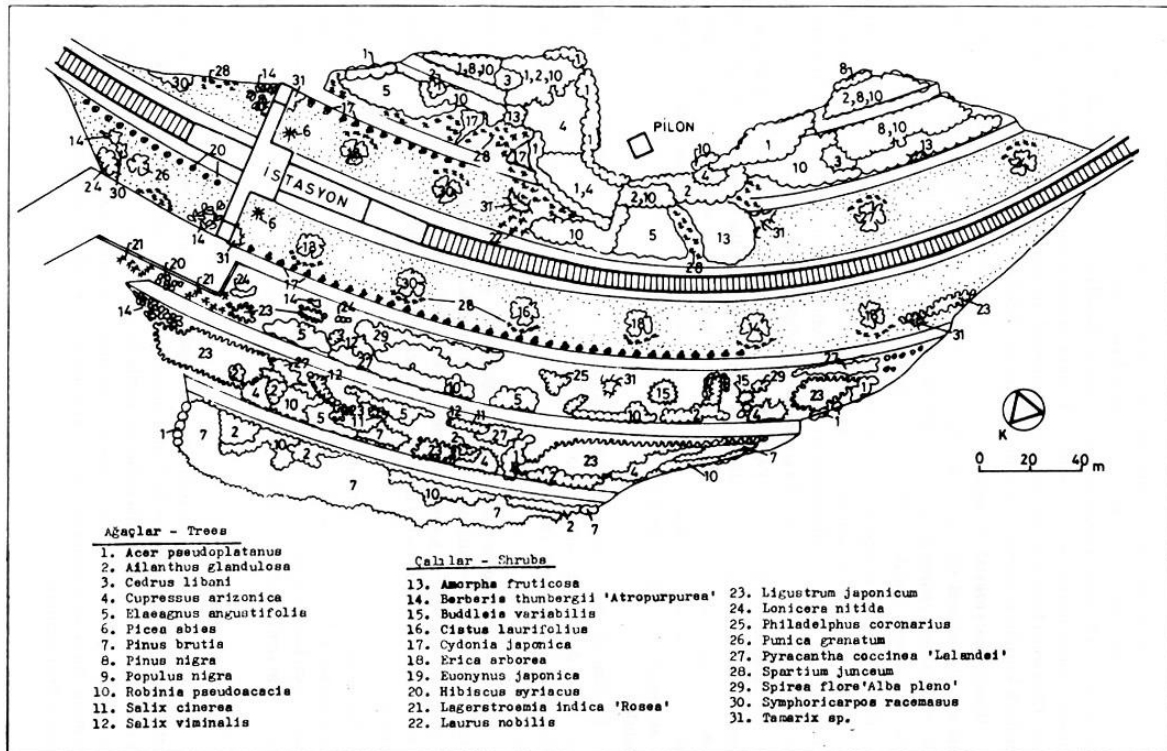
Planting plan of Kartaltepe (Kocatepe) slope stabilization project (Çelik, 1994)¹
